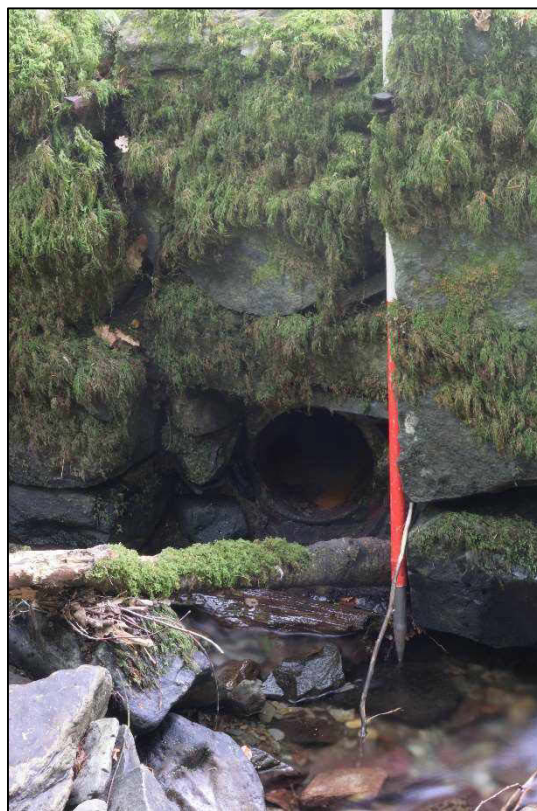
Details of the culvert under the building seen on the 1888 mapping
